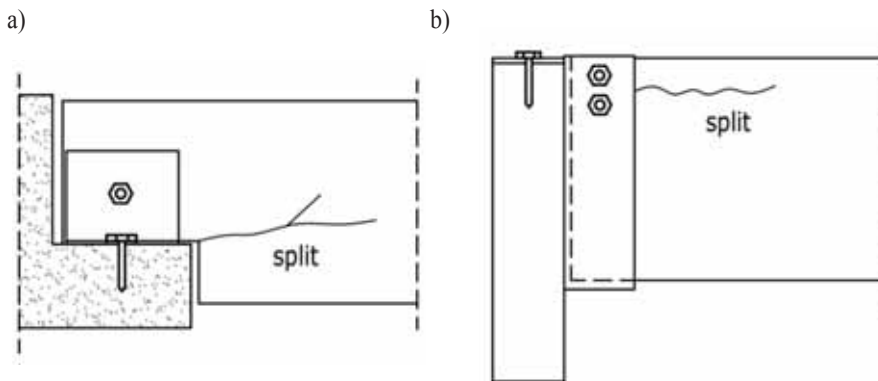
a) Notching at the end of beam, b) Beam-to-beam connections
